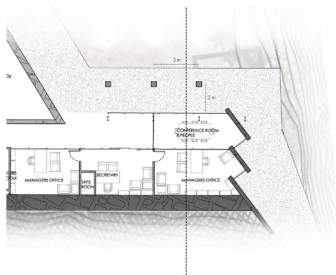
Vermiculture Building Plan (Author, June 2016).
